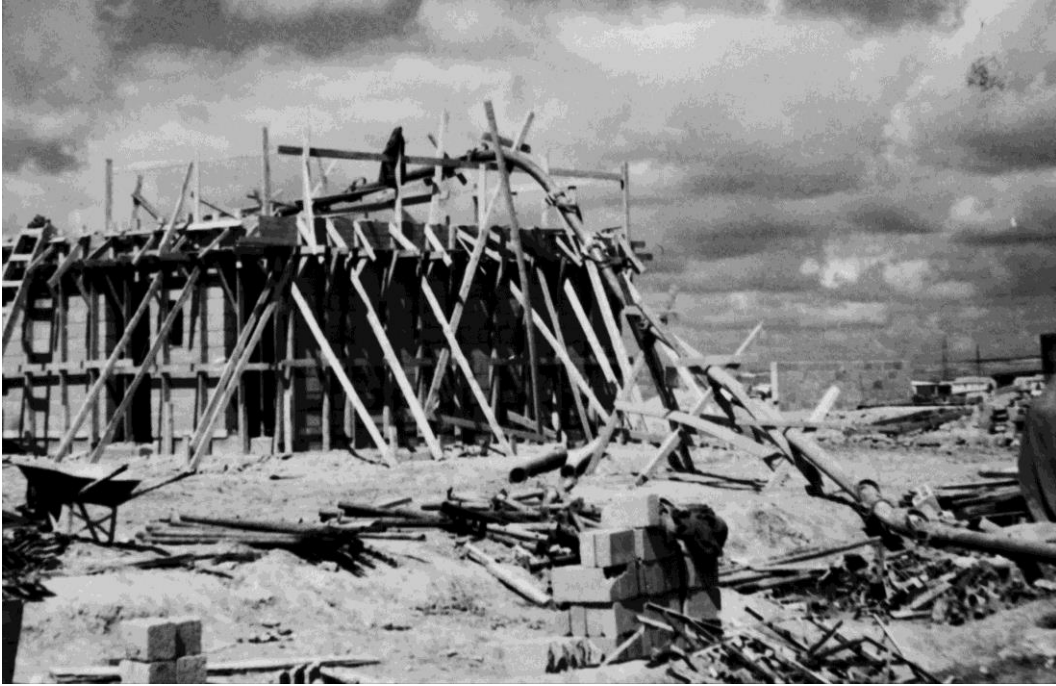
Carpet housing (type A), casting of the roof slab (Nahum Zolotov Collection, Information Centre for Israeli Art, The Israel Museum). The photograph suggests that a high concrete parapet was cast before the casting of the roof slab
